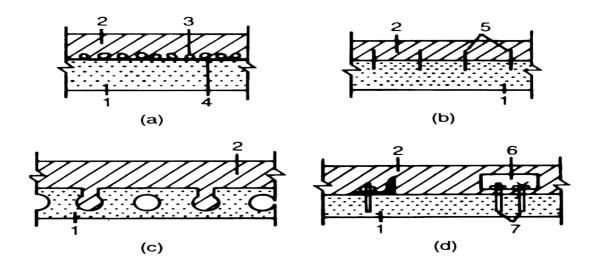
Slab overconcreting 1 - existing floor; 2 - overconcreting; 3 - gravel; 4 - epoxy adhesive; 5 - bolts attached with epoxy resins; 6 - connectors (metallic profile – angle); 7 - expandable bolts
